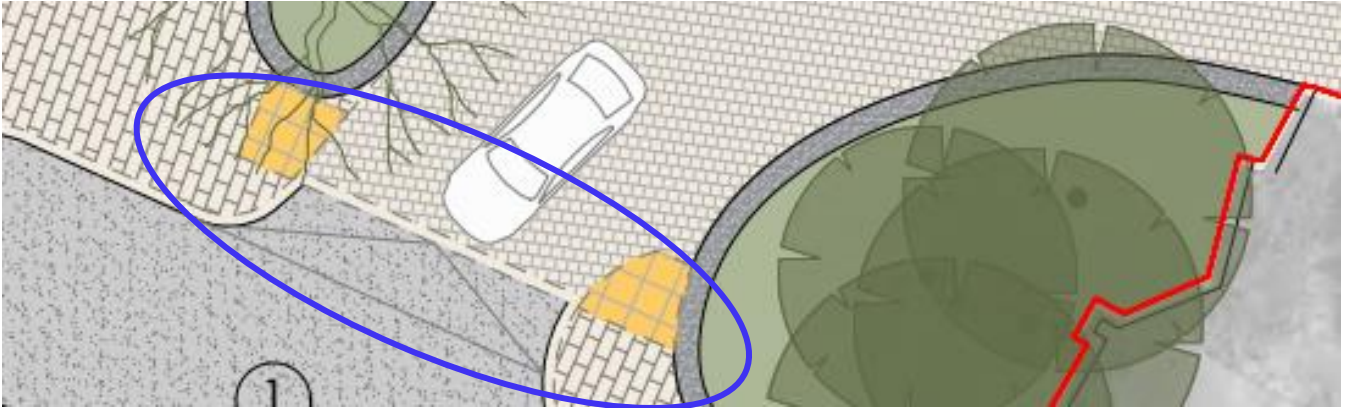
Proposed Pedestrian Crossing on Abbey Street
